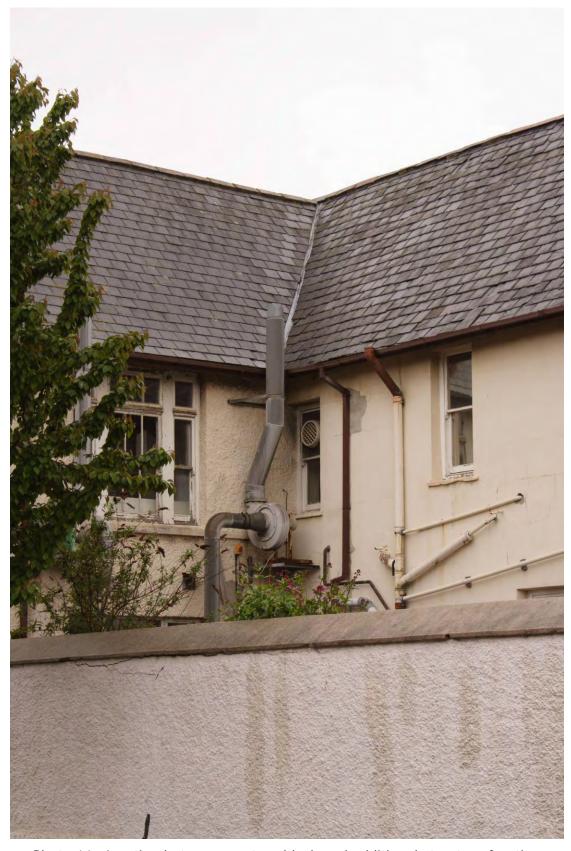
Junction between western block and additional structure fronting Caradoc Road
